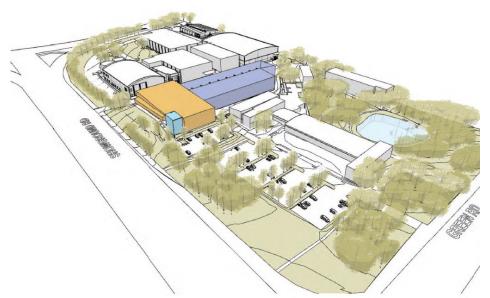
Elevated view of the site looking from Showground Road, showing the proposed Building J envelope in context of the existing MDC and TAFE buildings
